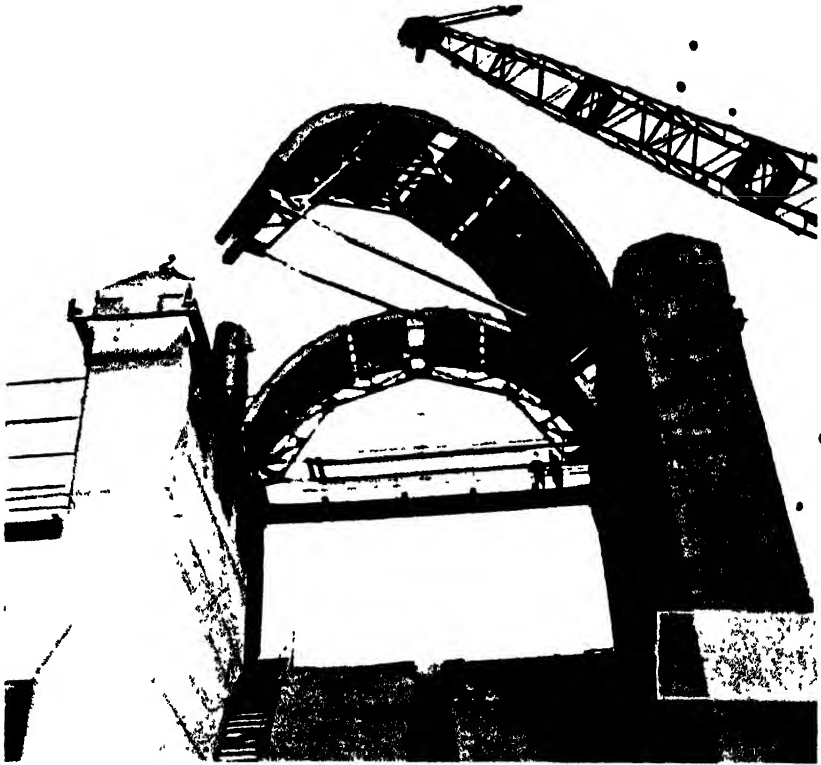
FORMS FOR 120-FT SPAN BOWSTRING ARCH BRIDGE
